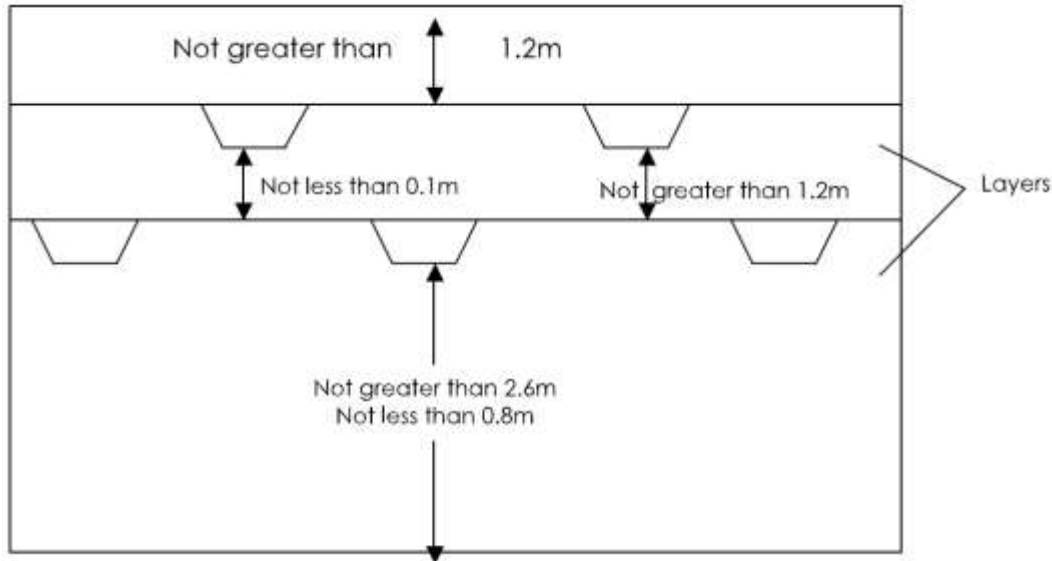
Diagram of South African Water Trough Barrier with Multiple Layer Configuration (MRAC 2002).
